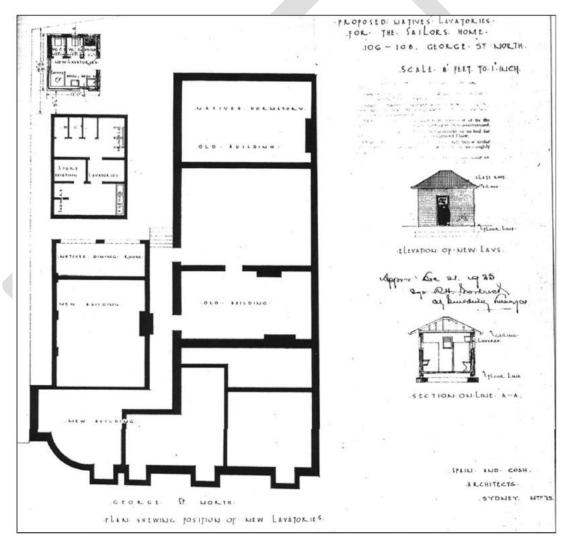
Plan showing proposed new "natives" lavatories, to be sited north east of the building and existing, 1922 lavatory block. (Source: City of Sydney Archives, 0540/25)
